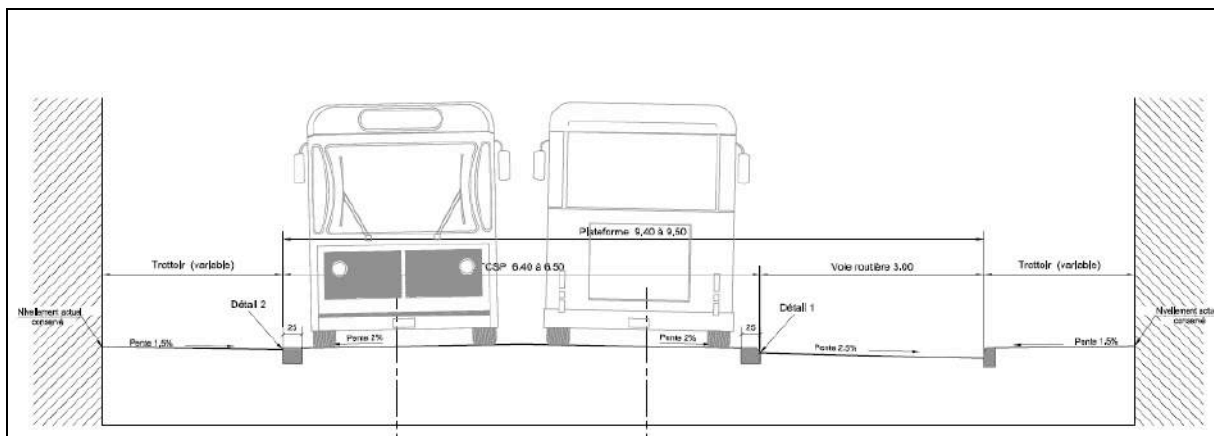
Section type n°5 the transit right of way and a 2 roadside lanes
